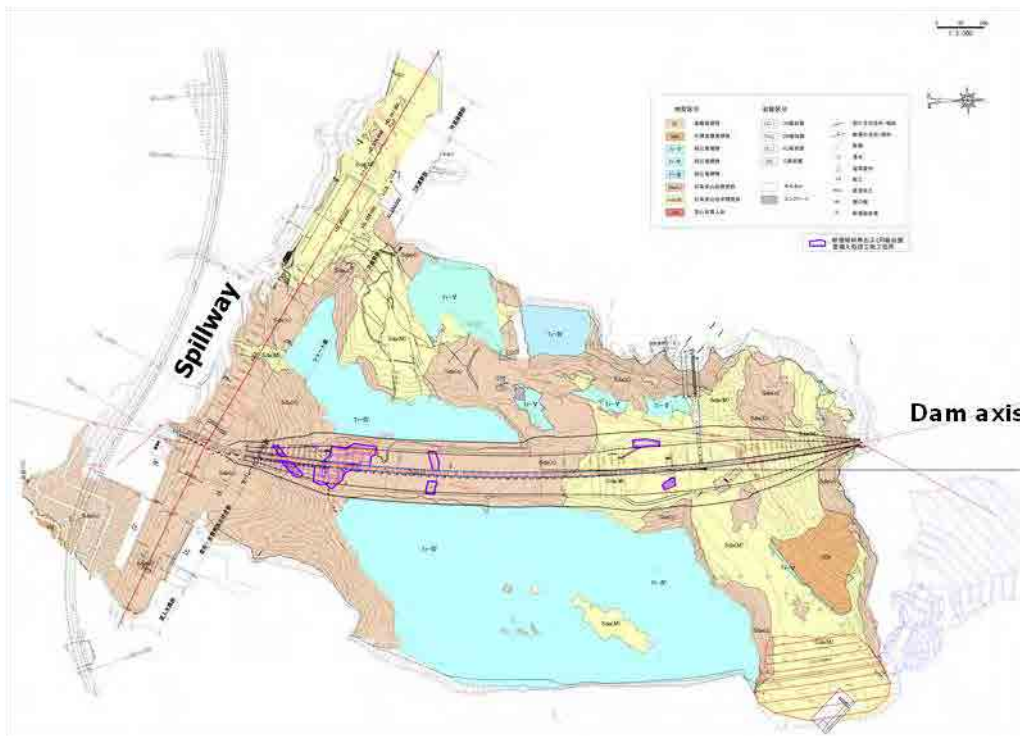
Geotechnical Sketch of Rockfill Dam Foundation (Geology)
